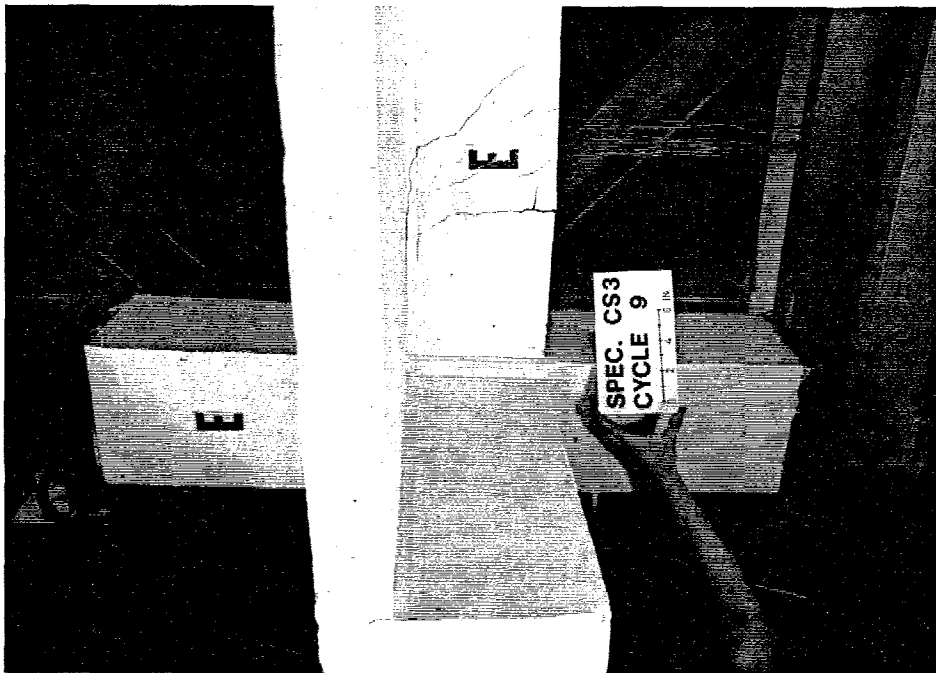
(a) Flexural Cracks in Specimen CS3 (Left Connection)
